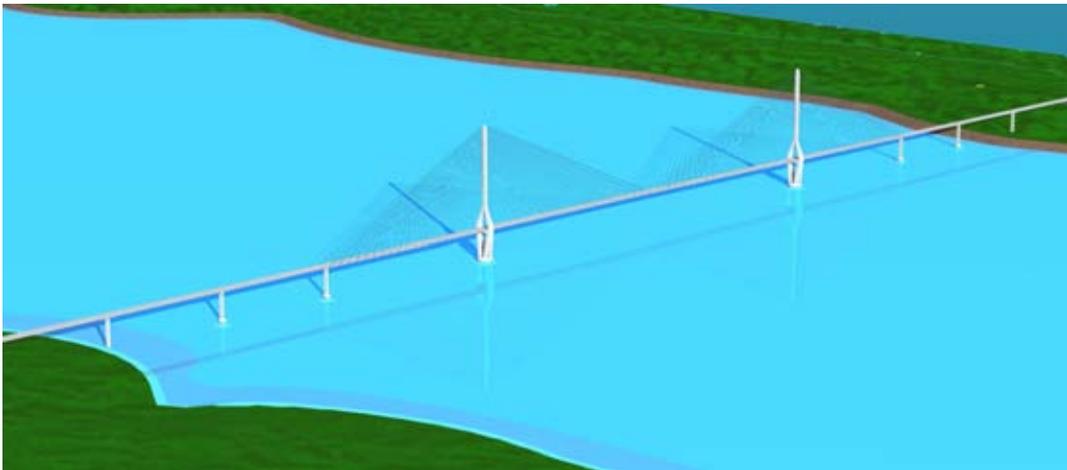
Cable-stayed bridge crossing with approaching spans [4, 5].
